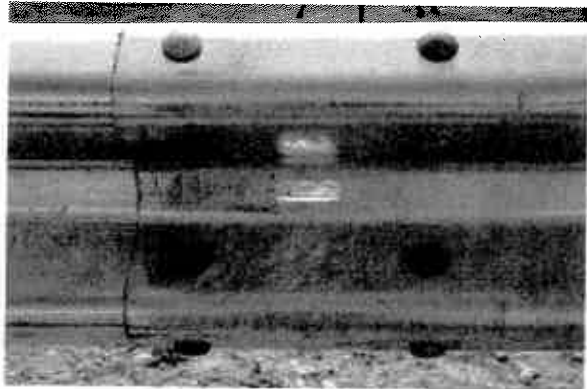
ET-PLUS for 787 mm (31-inch) high W-beam guardrail prior to testing.
